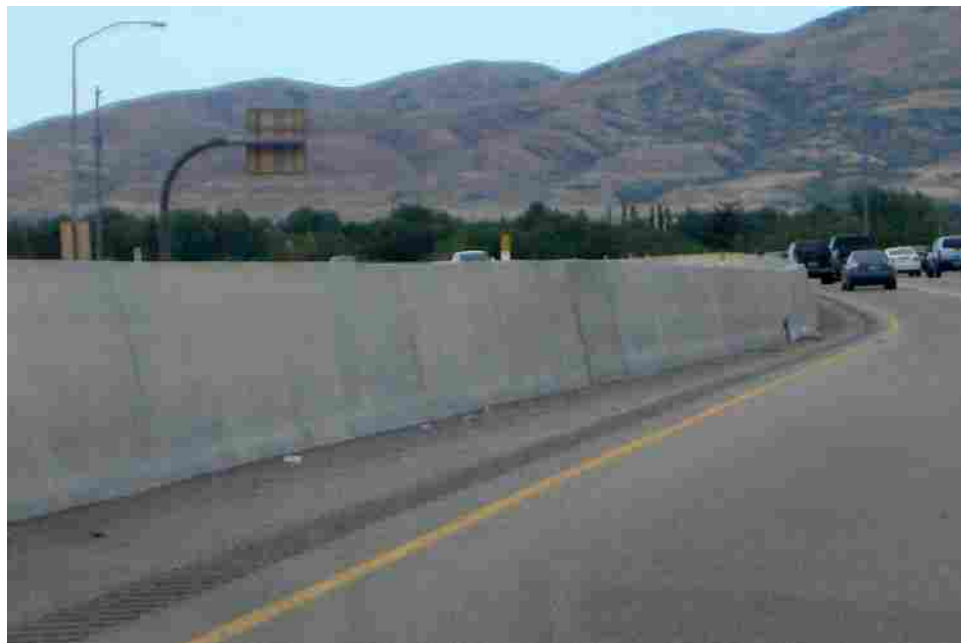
Single slope concrete barrier (photo by Katherine Winters 2008).
